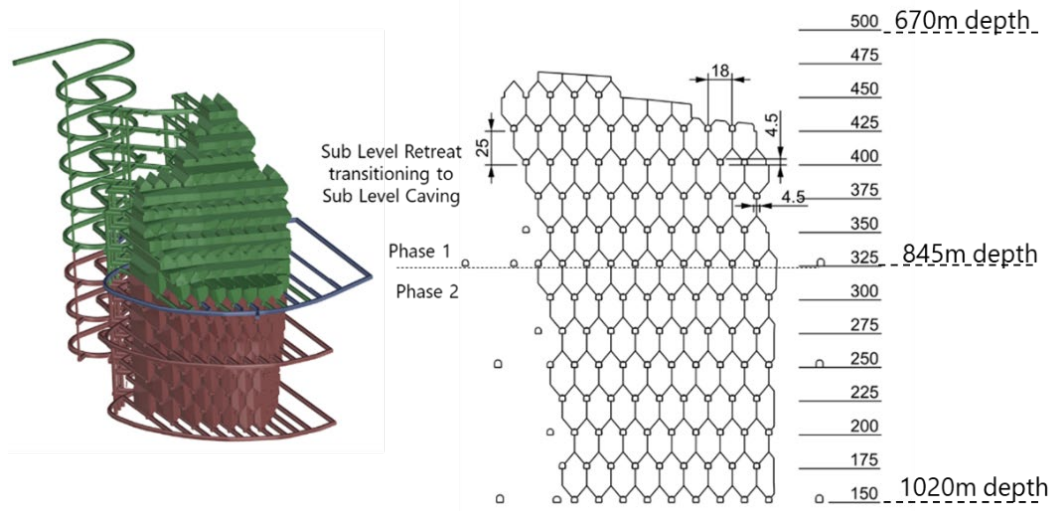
SLR/SLC layout for Centre Pipe listing the mining levels
